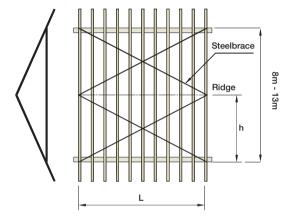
Steelbrace layout for very short roof, spans 8m to 13m
